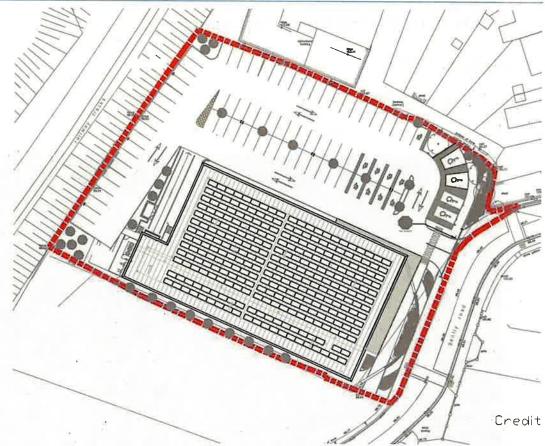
Extract from drawing no. 20984-THPK-09-XX-DR-A-0103 "Proposed Site Plan" showing the proposed site and panel layout.
